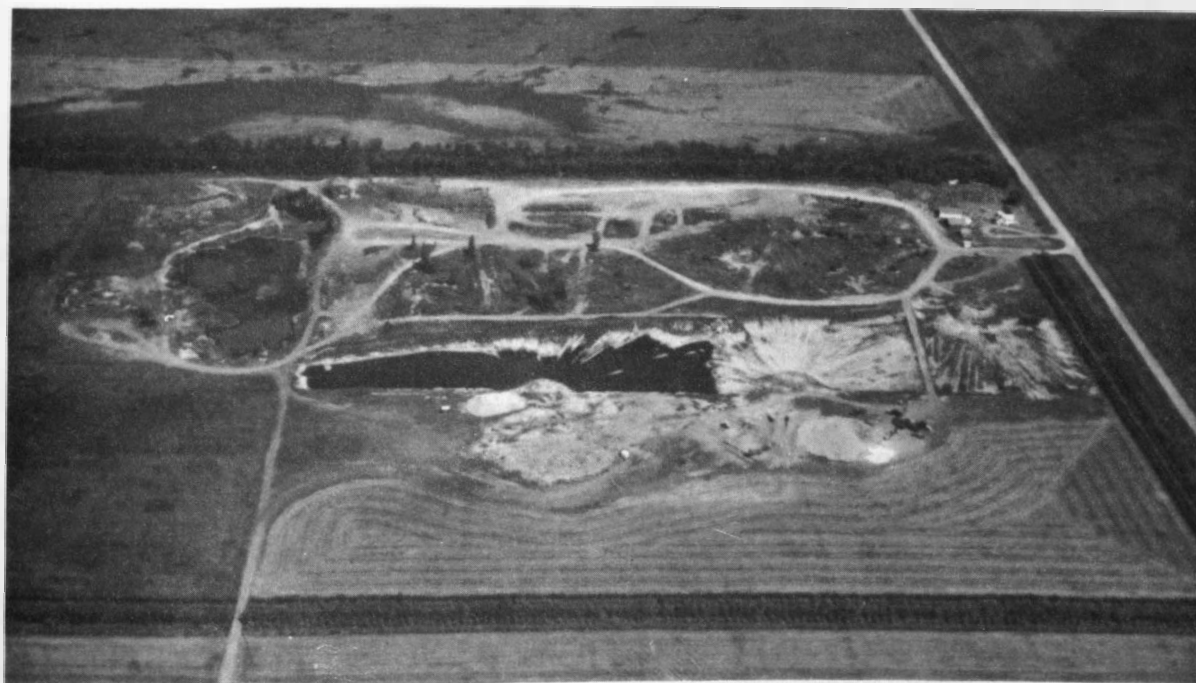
Brookings refuse disposal area, looking toward north, July 1966.
